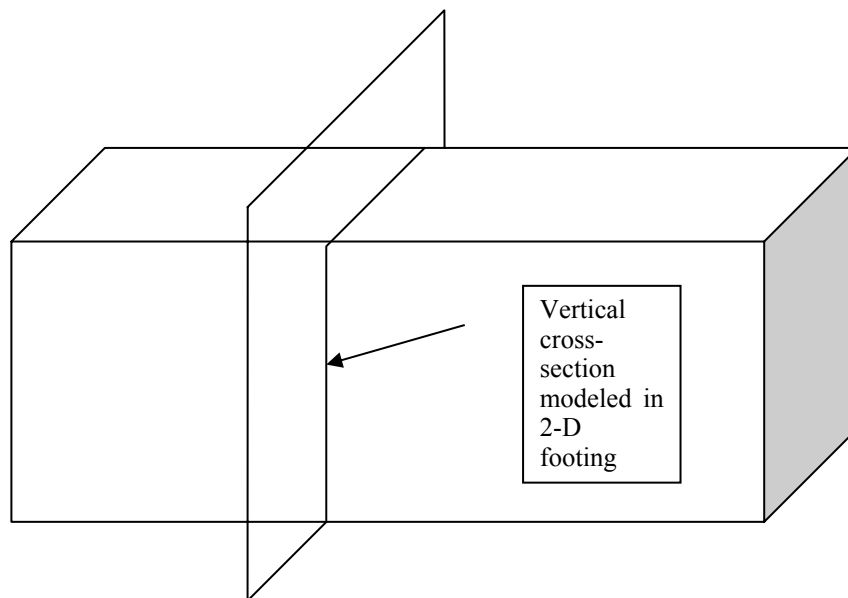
Diagram of the vertical cross-section assumed in modeling a 2-D footing
